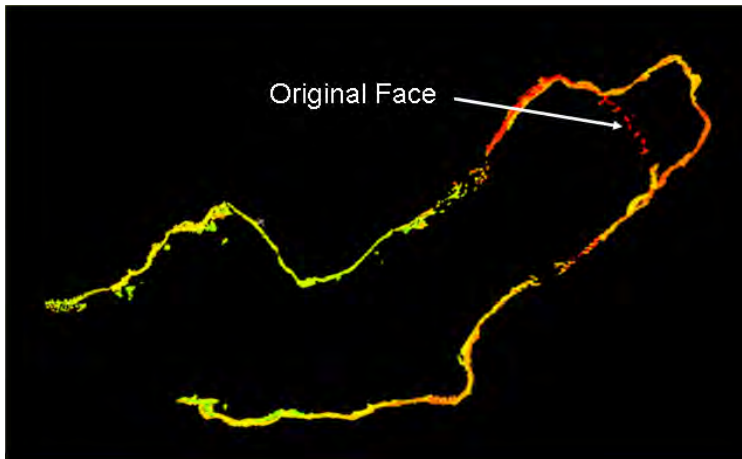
Plan view of XC 11, showing the original face and the area extracted by the shot on 11/7/06.
